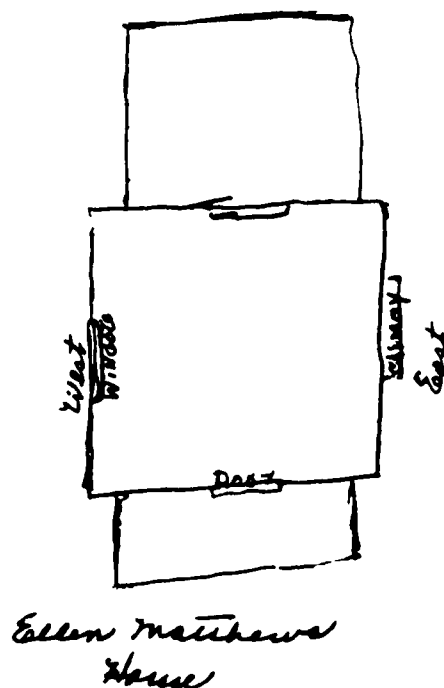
Sketch Map of Floor Plan for Ellen Mathews House
